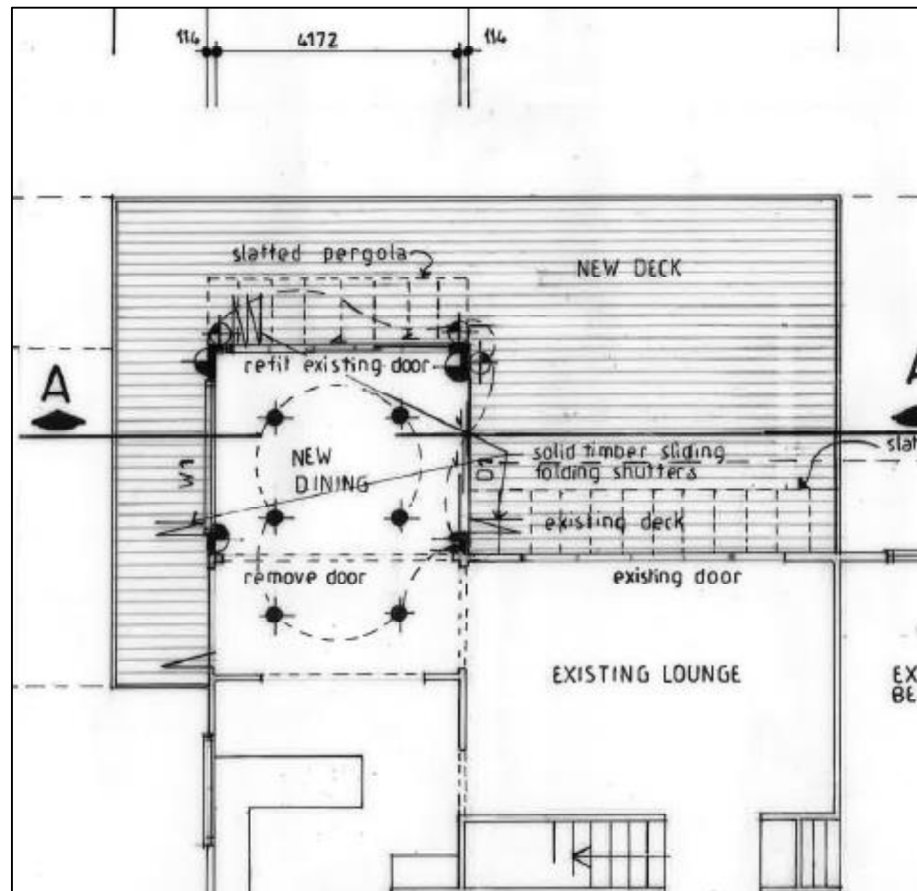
NEW DECK & DINING ROOM EXTENSION
